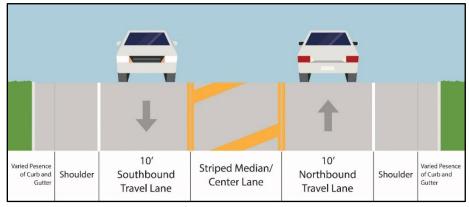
Typical Section of Proposed Road Diet Pavement Striping Plan
